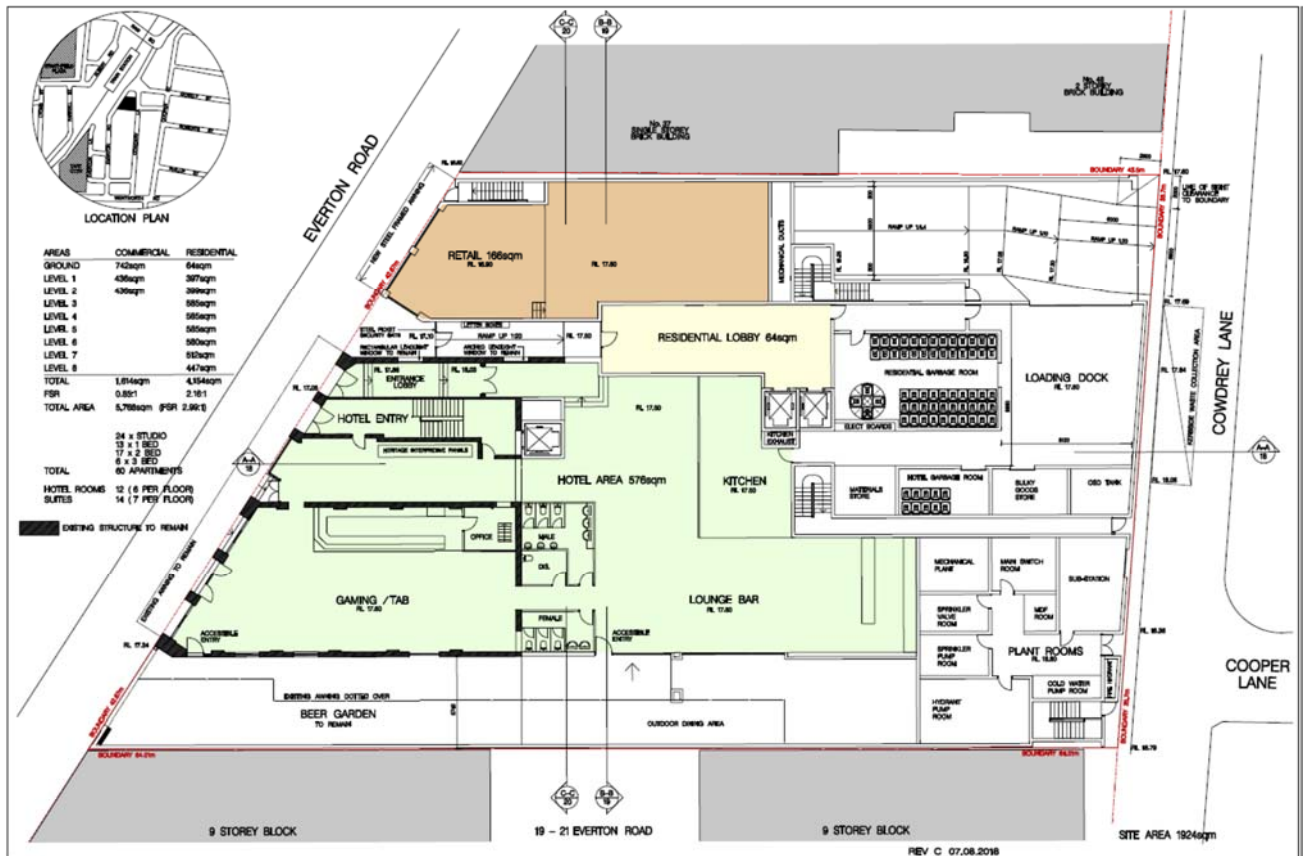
Ground Level Plan (Revision C) - Source ARC Architects
